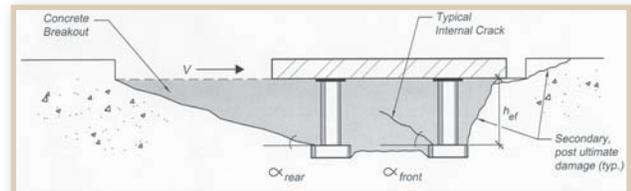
Sketch of a concrete pryout failure (courtesy of PCI Journal)
